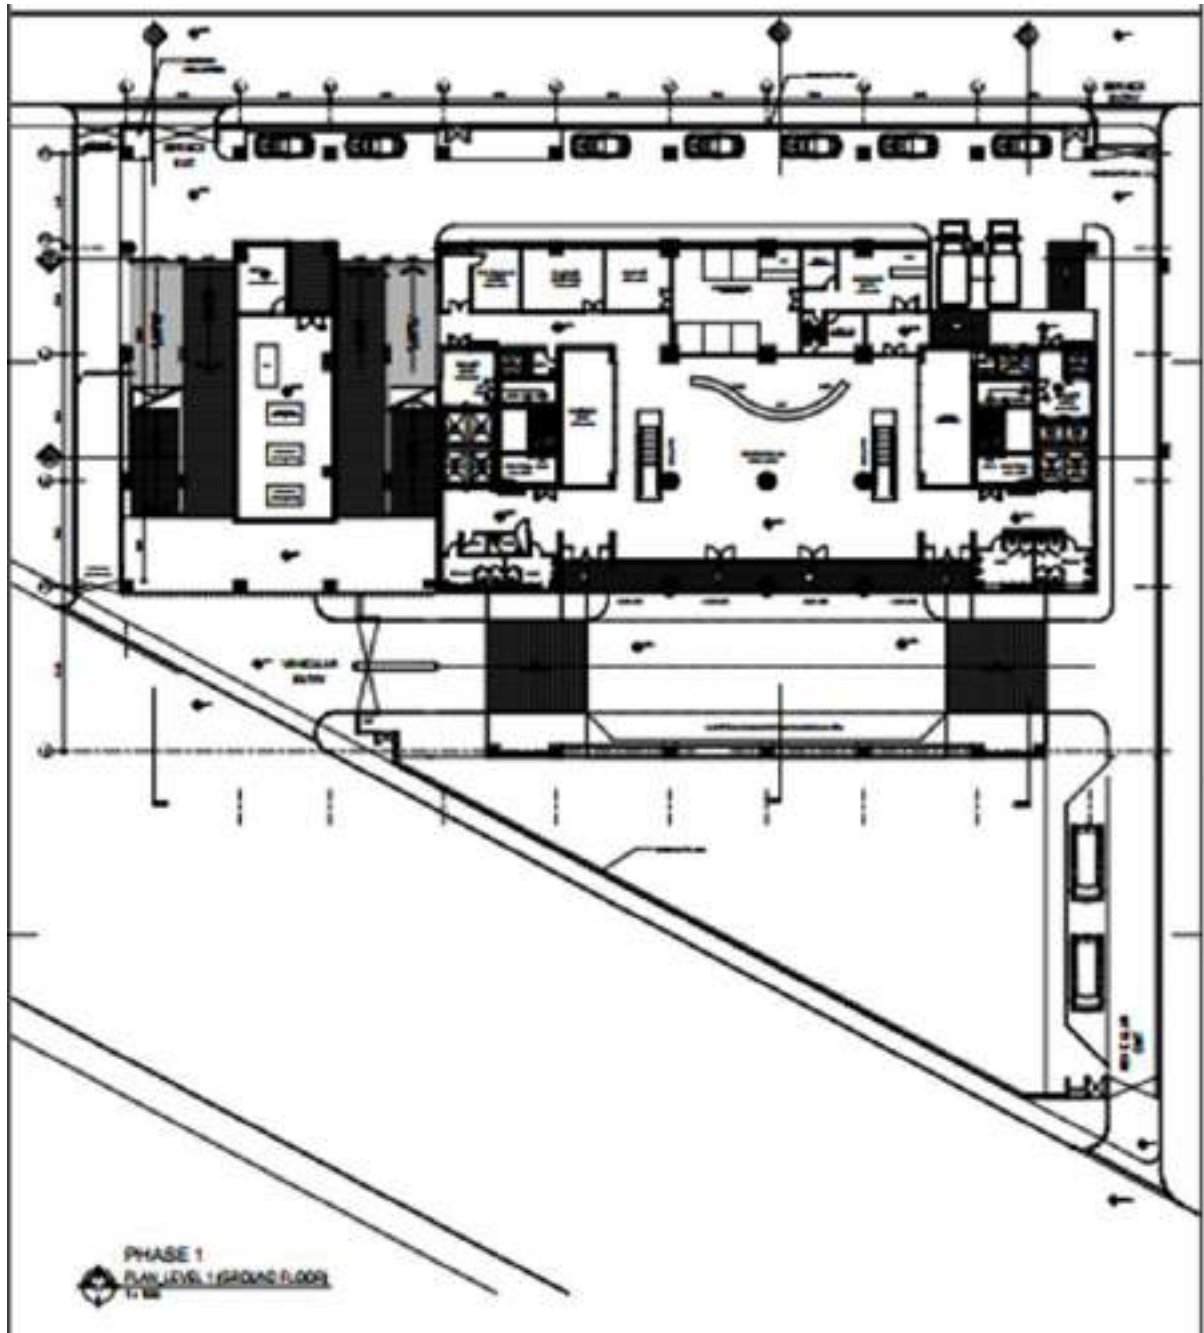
Parking Facilities (Level-1: Ground Floor).
